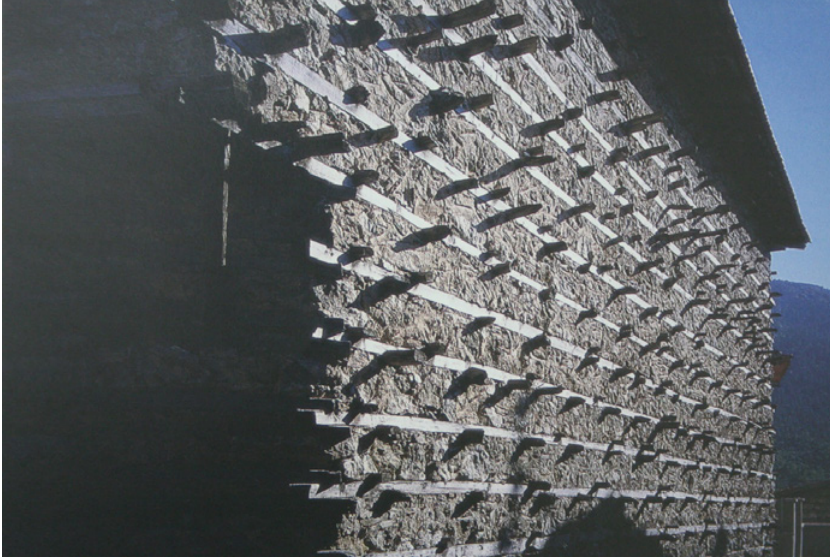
A wall with piştuvans (pişduvans)- düğmeli ev
